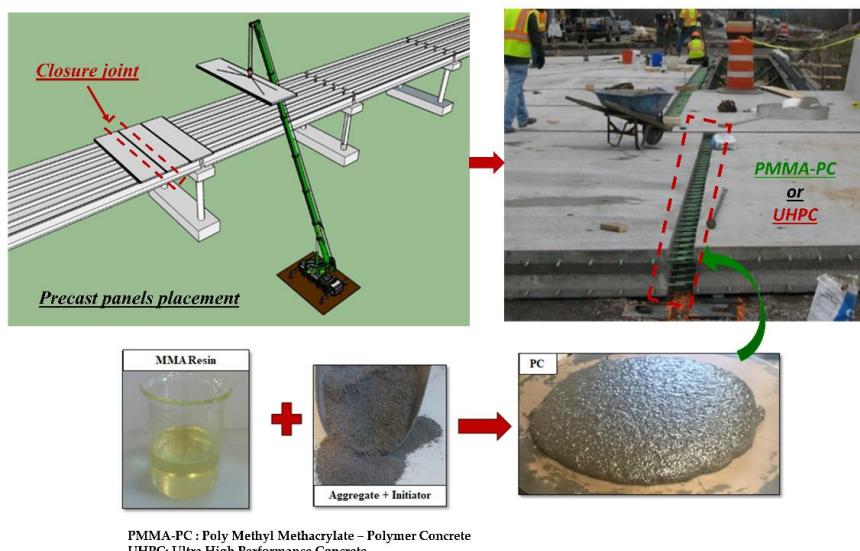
Graphical abstract for the proposed polymer concrete for bridge deck closure joints.
